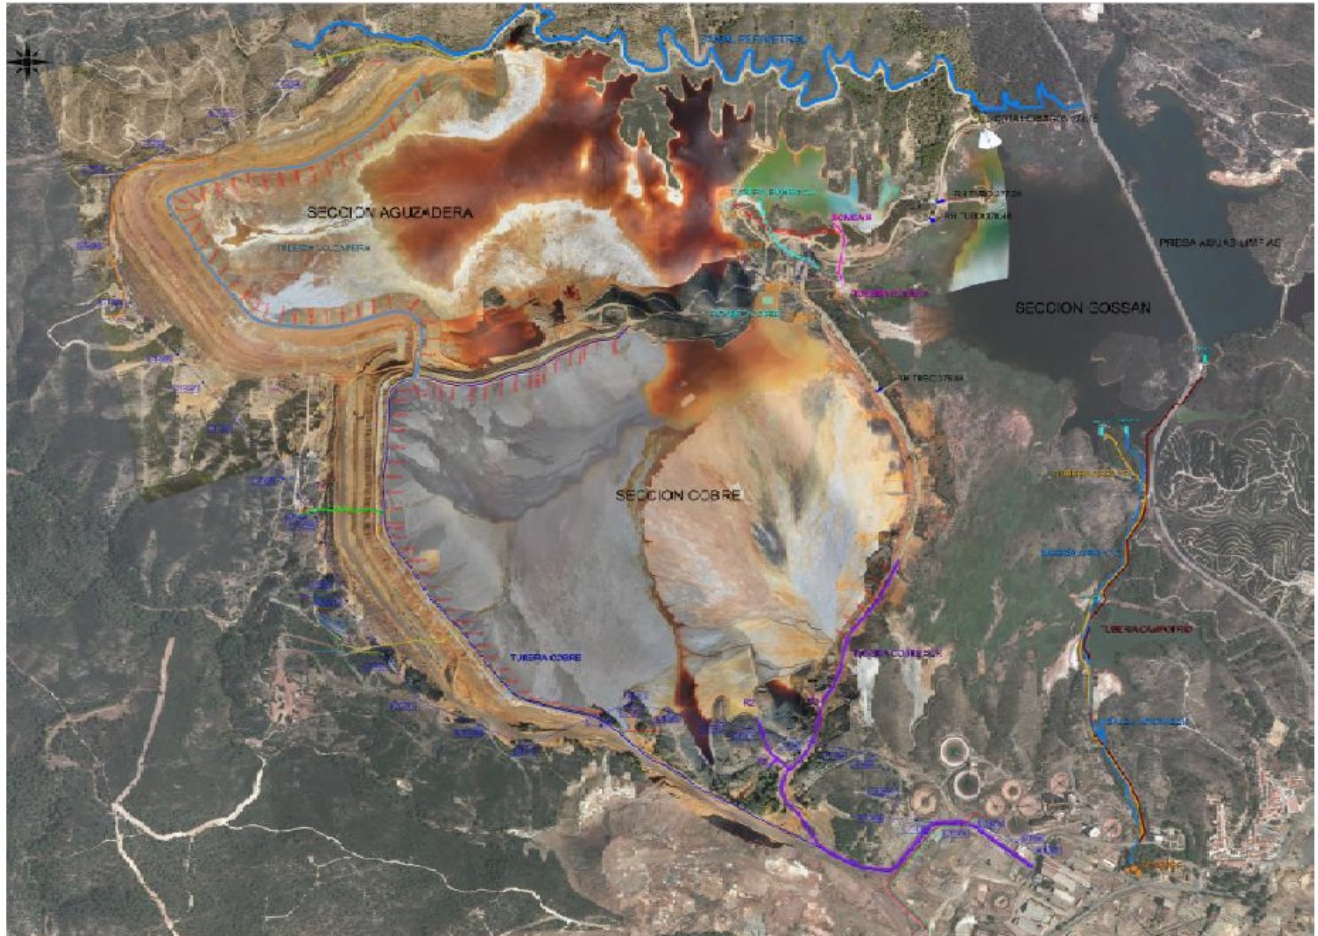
Layout of Tailings Management Facility (Golder 2016)
